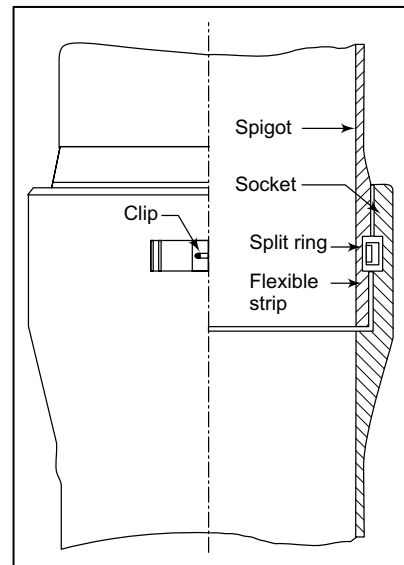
Mechanical locking joint (half-sectional view) for rigid PVC well pipes.
